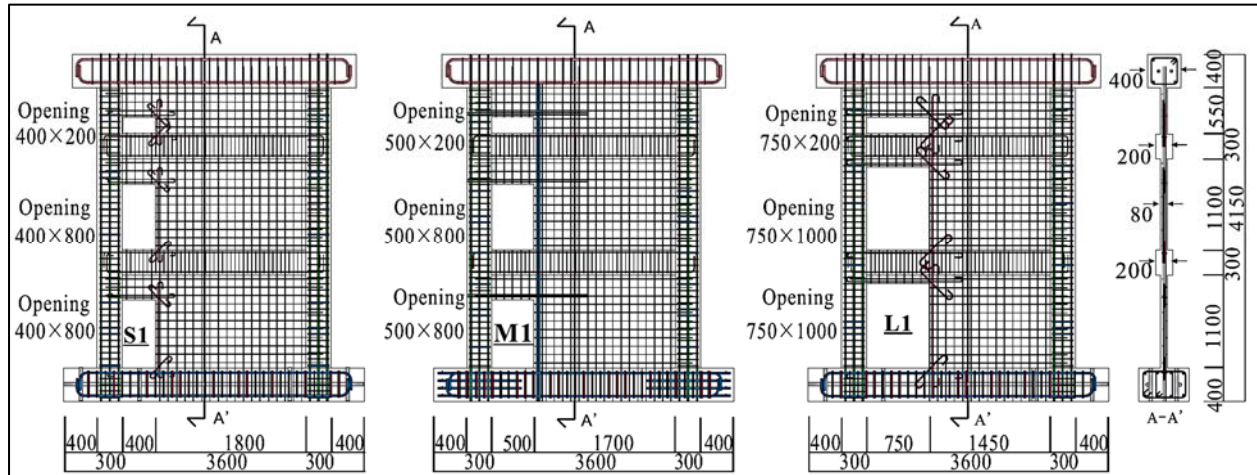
Dimensions and reinforcement arrangement (all dimensions in mm).
